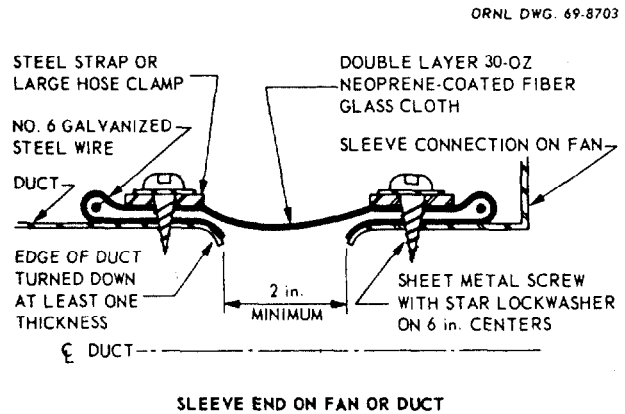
Recommended design for flexible connections between fan and ductwork.
